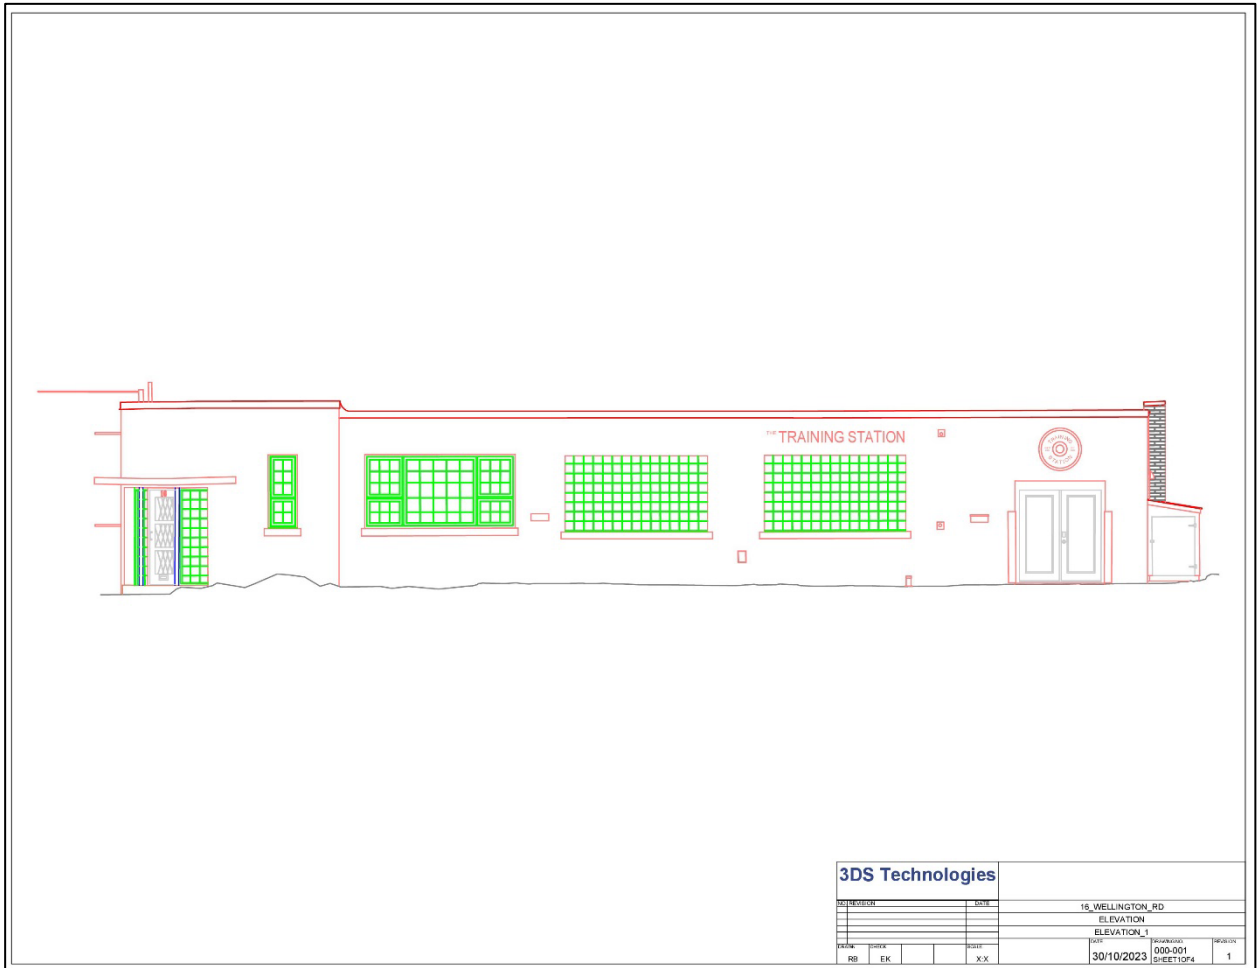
South elevation of the building at 16 Wellington Road (3DS Technologies, dated October 30, 2023).
